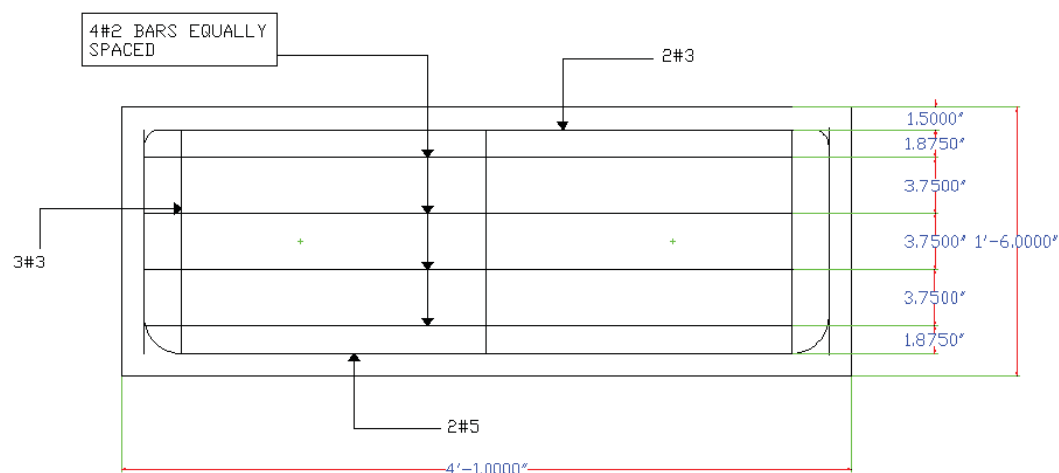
Reinforcement details of 457mm (18in) deep beam
